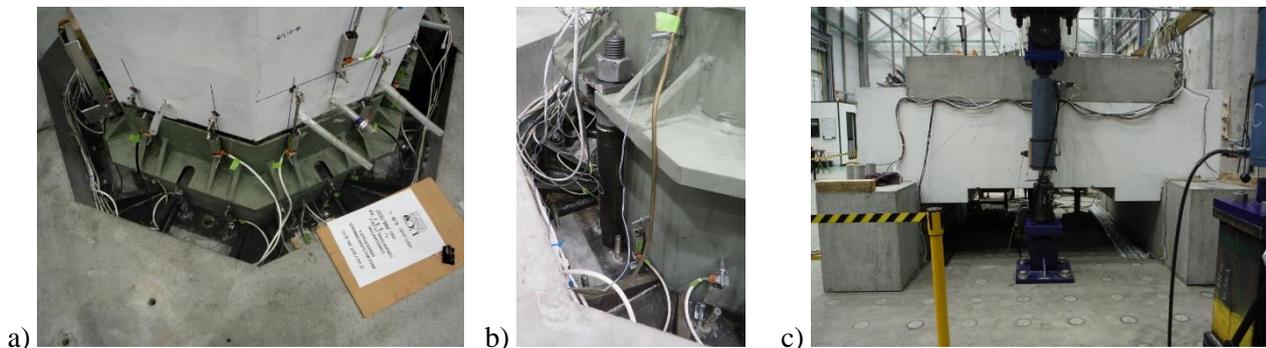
Details of the specimen. a) and b) Details of the base of the column showing the dissipater attachment points and an installed dissipater. c) Side view of the pile cap seated on the ground beams.
